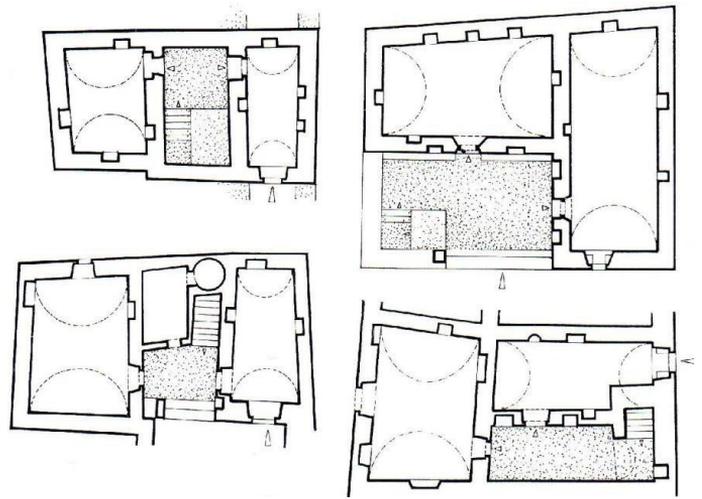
Floor plans of houses with “solar” or “poundi”² in Chios (Agapitou-Kyritsi 2010, 28)
